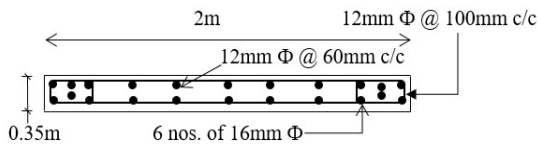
Reinforcement details of wall specimen analyzed with different axial load ratios
